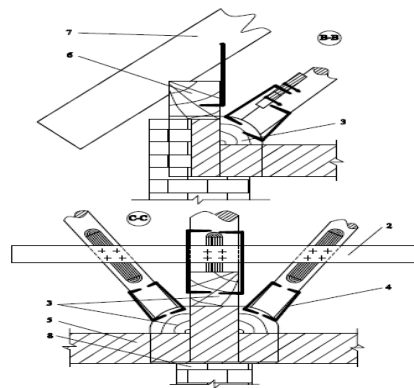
Longitudinal framing walls for 9.00 m < L < 11.00 m
